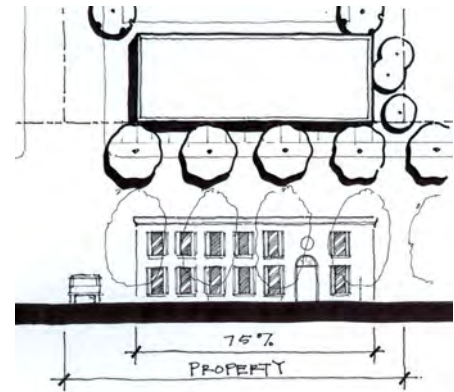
Building facades shall occupy at least 75% of the lot frontage at the front building line.
